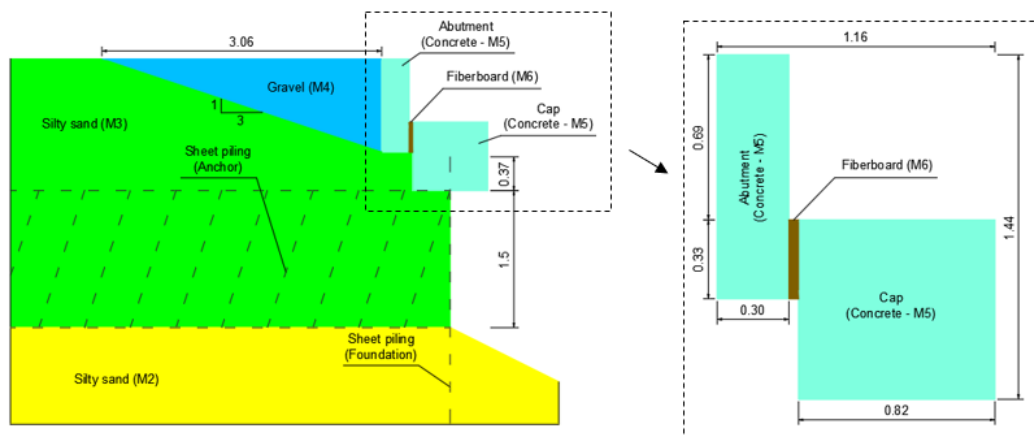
Detail of the bridge abutment and pile cap (dimension in m)
